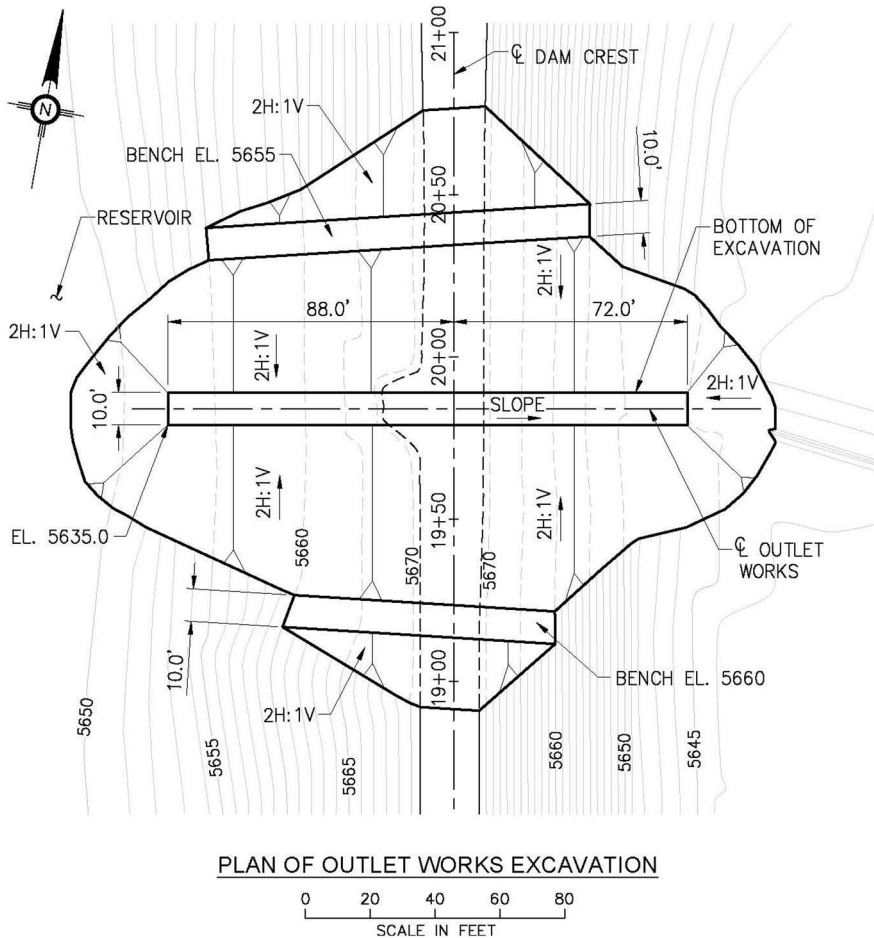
S-11. Excavation Catch Lines with Intermediate Benches
